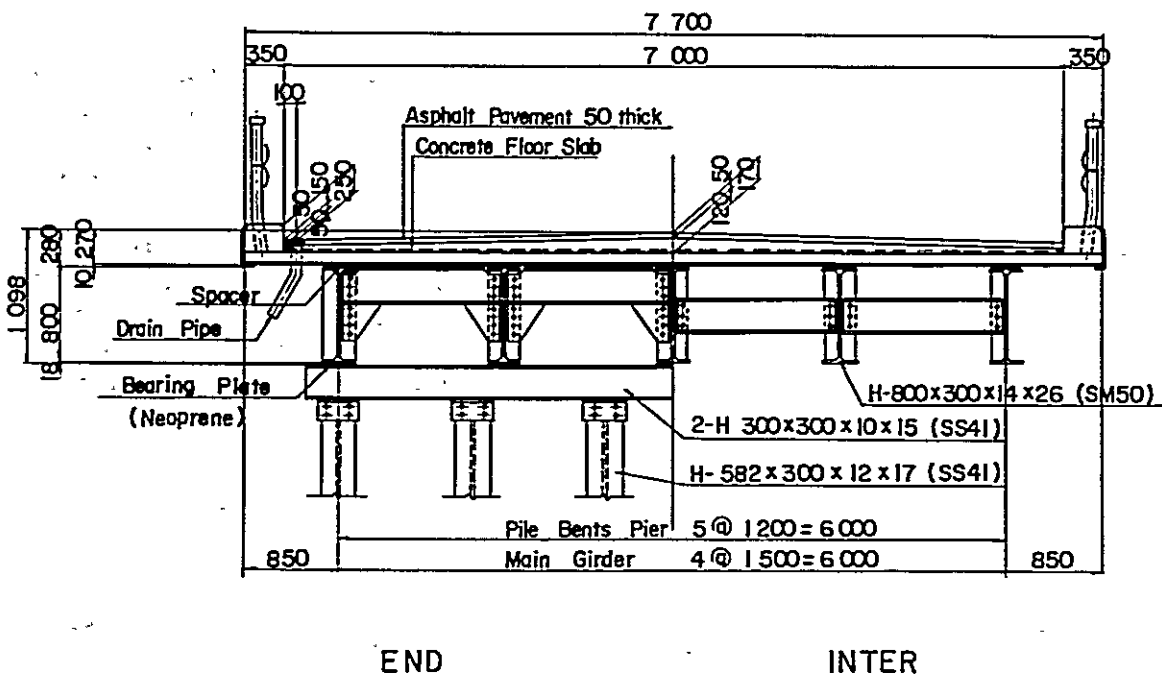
STANDARD CROSS SECTION OF BRIDGES OVER FLOOD OPENINGS
